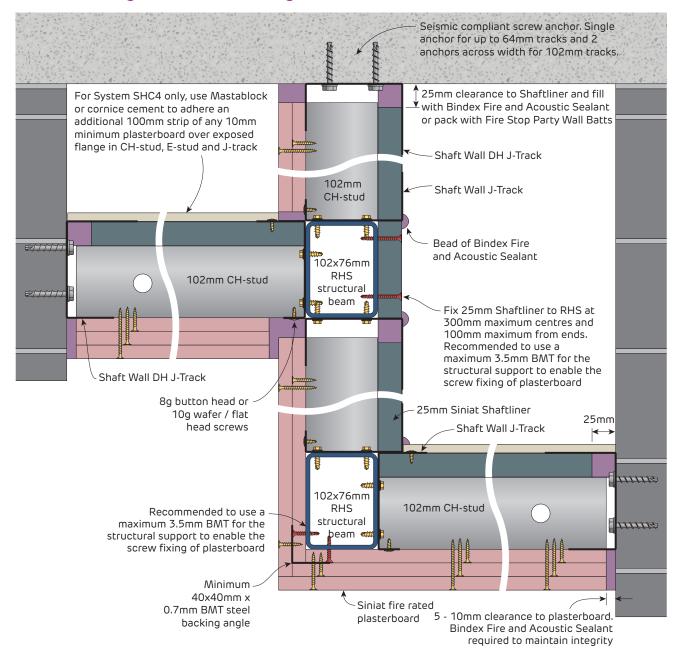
Shaft Wall Ceilings and Bulkhead using RHS Structural Columns and Beams SHW2 and SHC4
